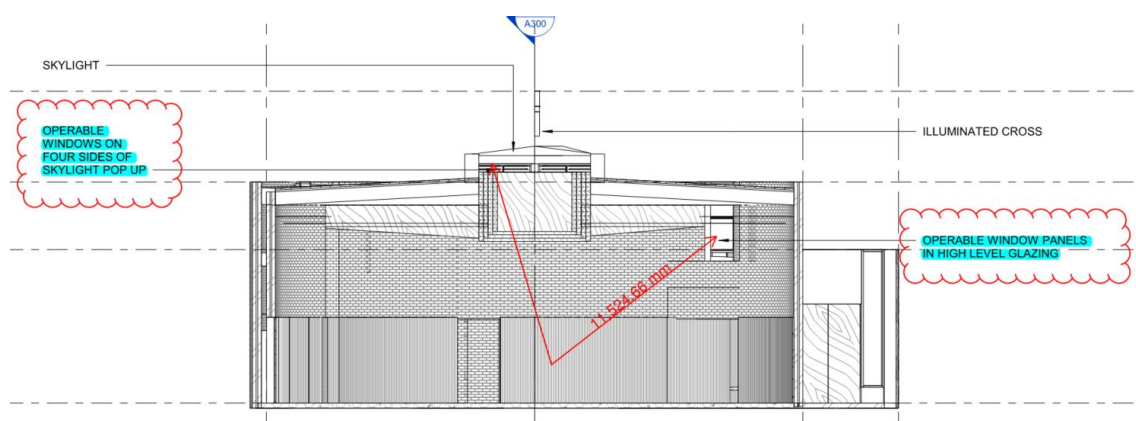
Natural ventilation for building – Breez path and operable windows (Section view)
